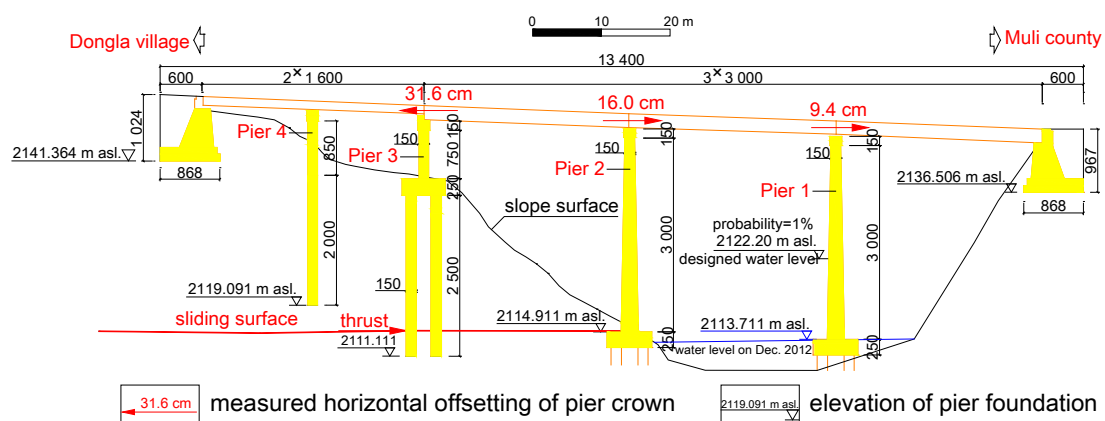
Displacements of the Dongla Bridge's piers and structure of the bridge (elevation unit:m; other unit:cm; red arrow indicating the direction of pier's displacement and thrust of the DRL) (modified after Wang, 2013).
